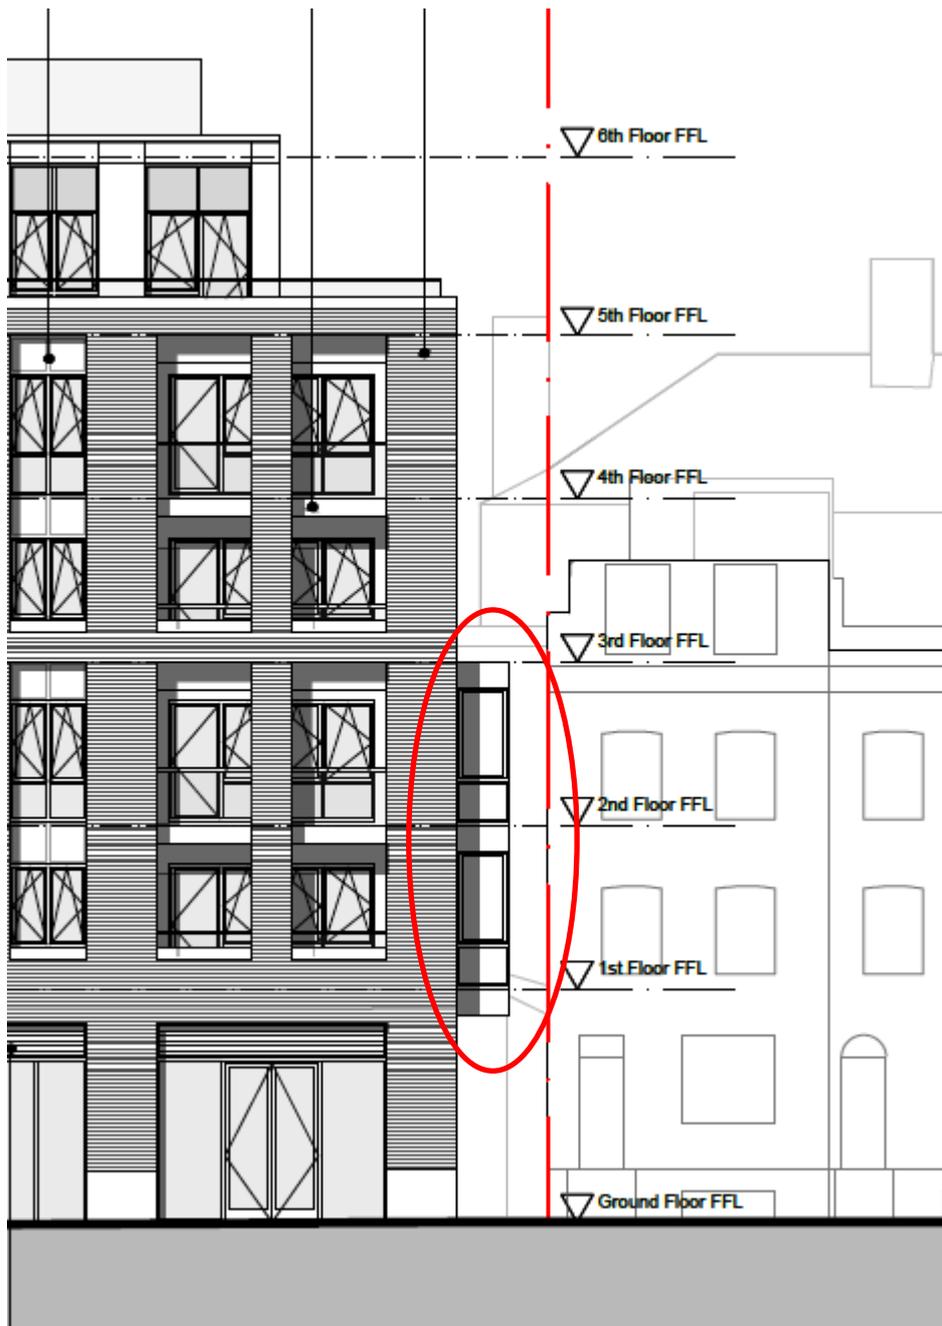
Proposed location of oriel windows adjacent to 283 Cambridge Heath Road
